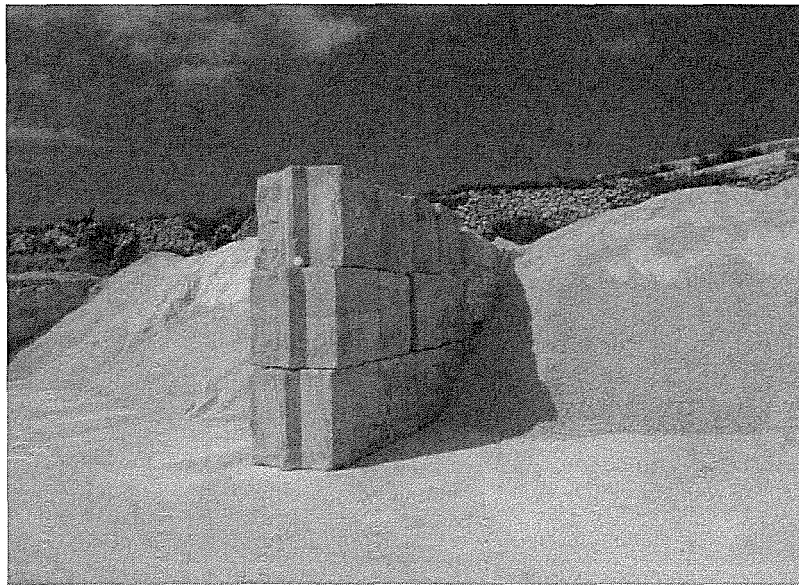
Dwarf walls made from recycled block work separating stockpiles of NA.
